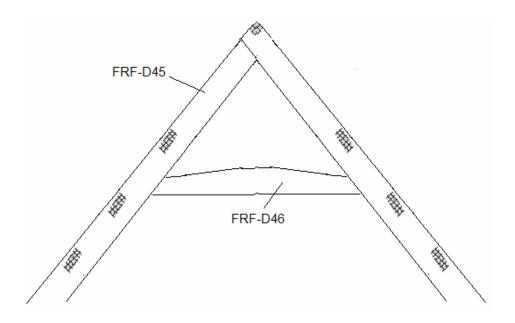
Connecting range; sketch of truss 12, showing the location of samples FRF-D45 and FRF-D46
